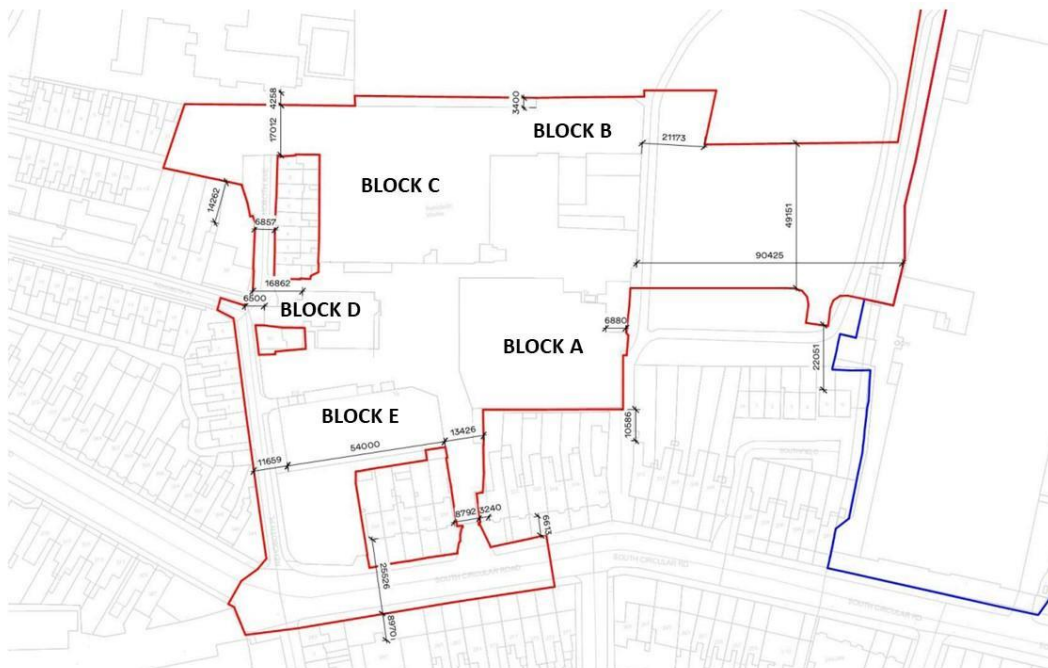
Key Plan Identifying The Existing Blocks On Site.
